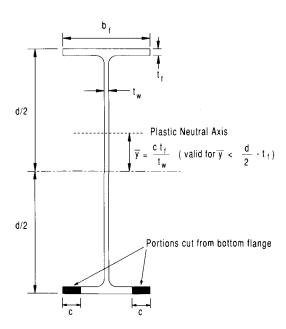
Cross-Section of RBS with Bottom Flange Cutouts
